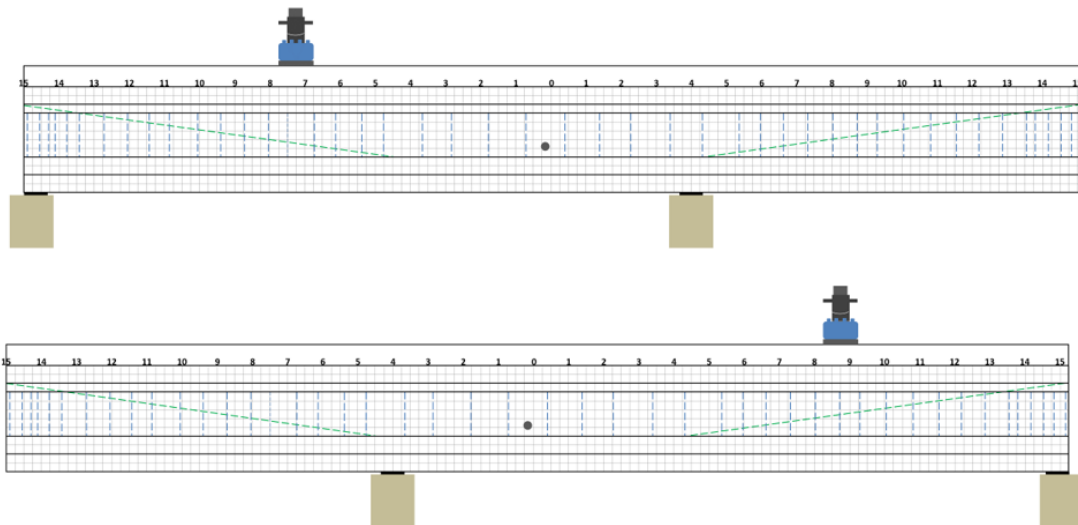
Overview of test setup for (top) shear test A1, and (bottom) shear test A2
